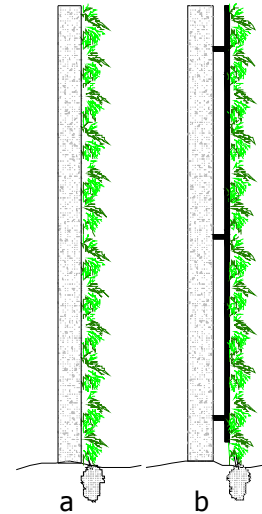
principles of plants rooted into the ground; use of self-climbing plants, (a) directly to the wall; (b) indirectly to the wall (with supporting structure).
